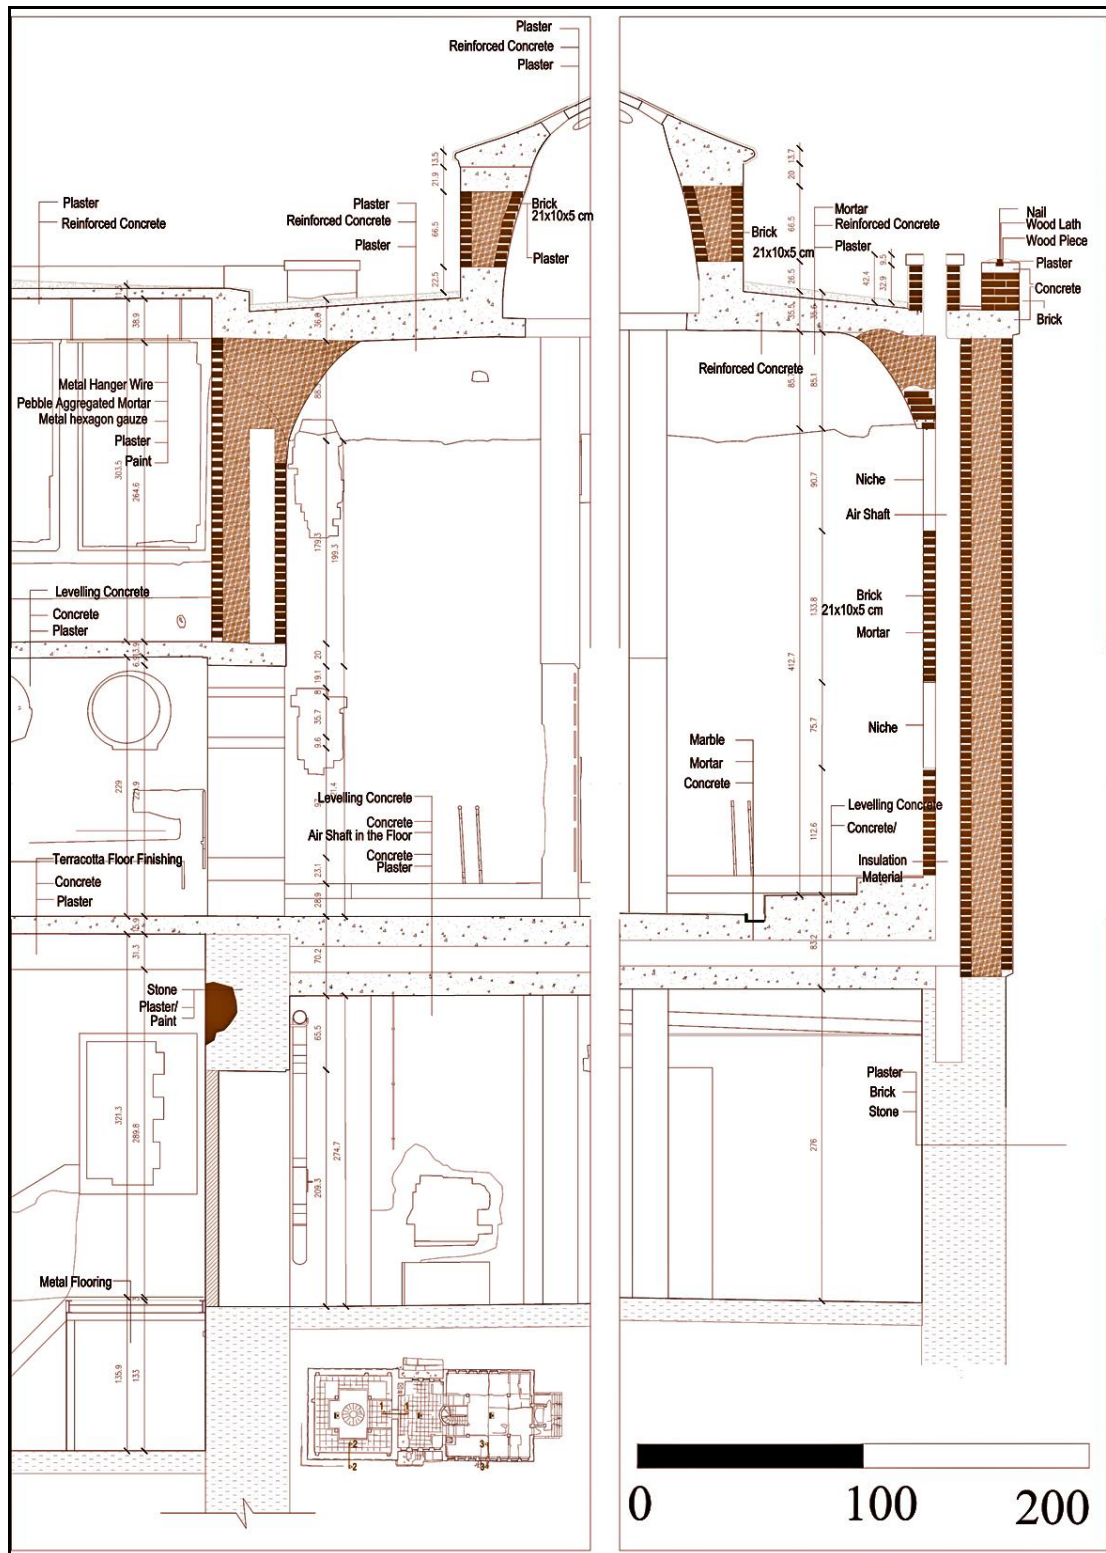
Construction Technique- Detail Drawing 1-1, 2-2
